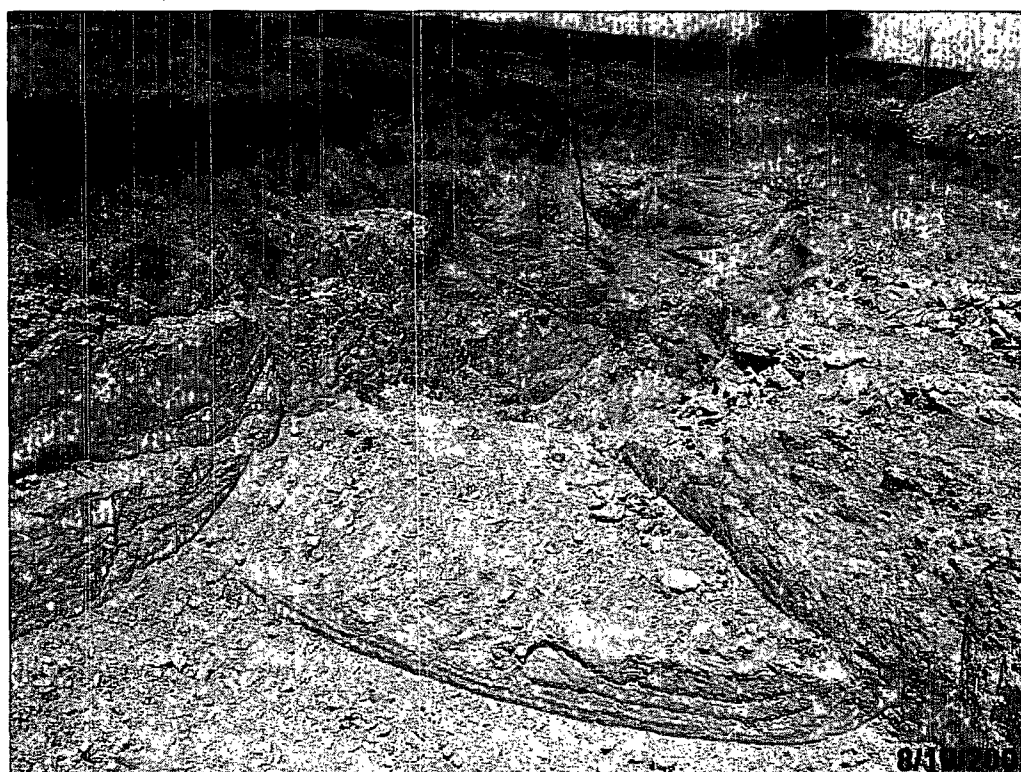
Looking easterly at excavation as of August 4, 2005.
